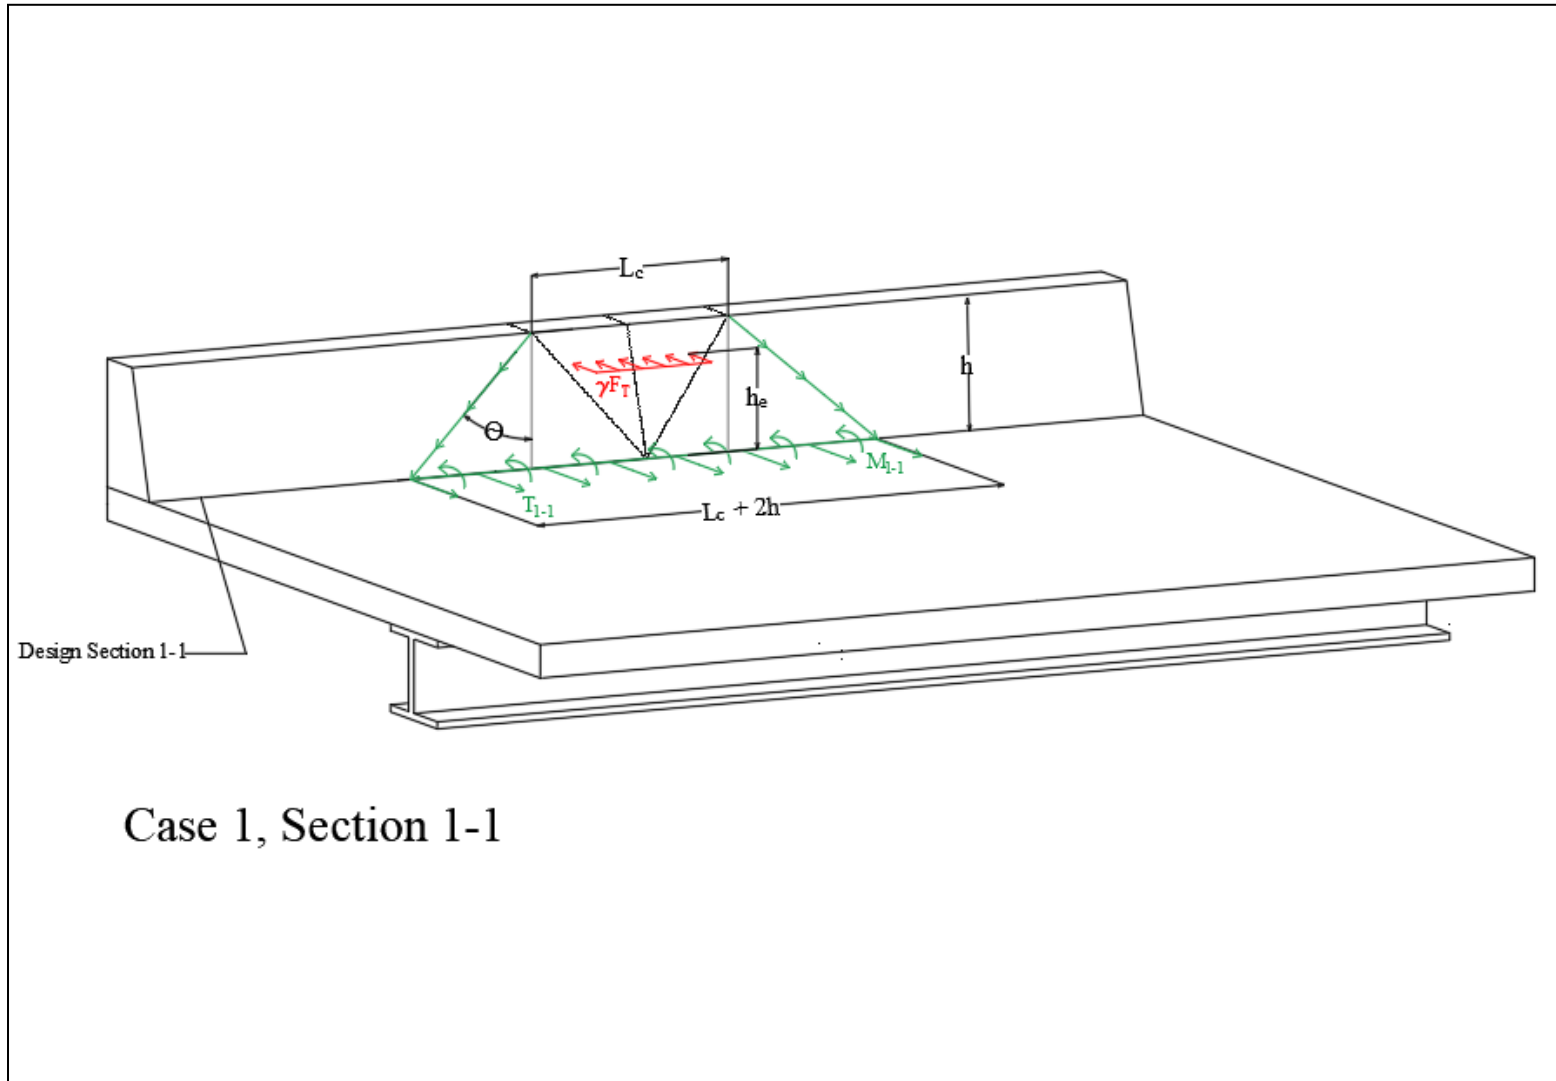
Generic Bridge Rail for Load Design Case 1, Section 1-1
